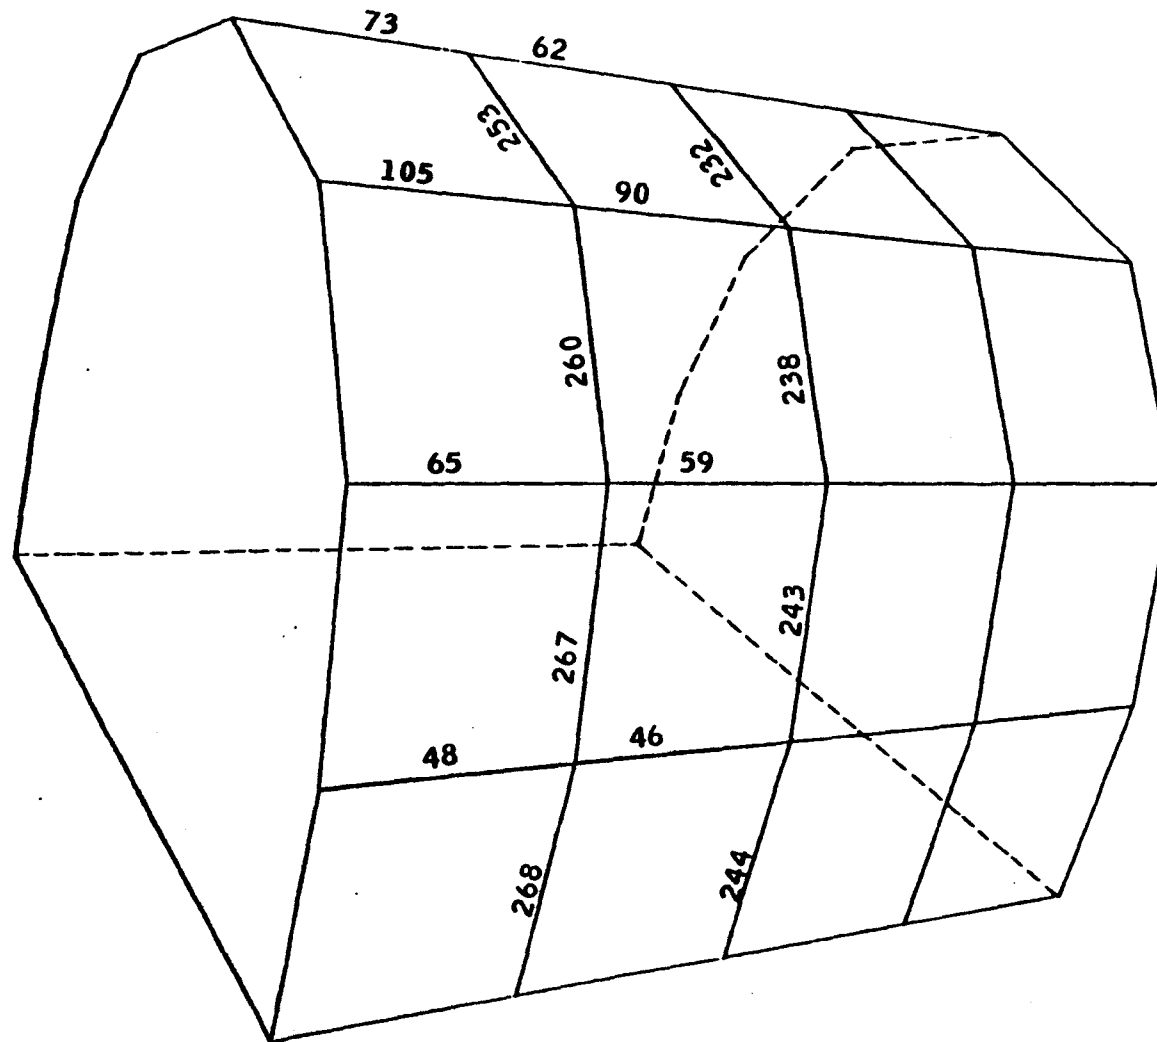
2 - Tension forces in the cables (in kN)
